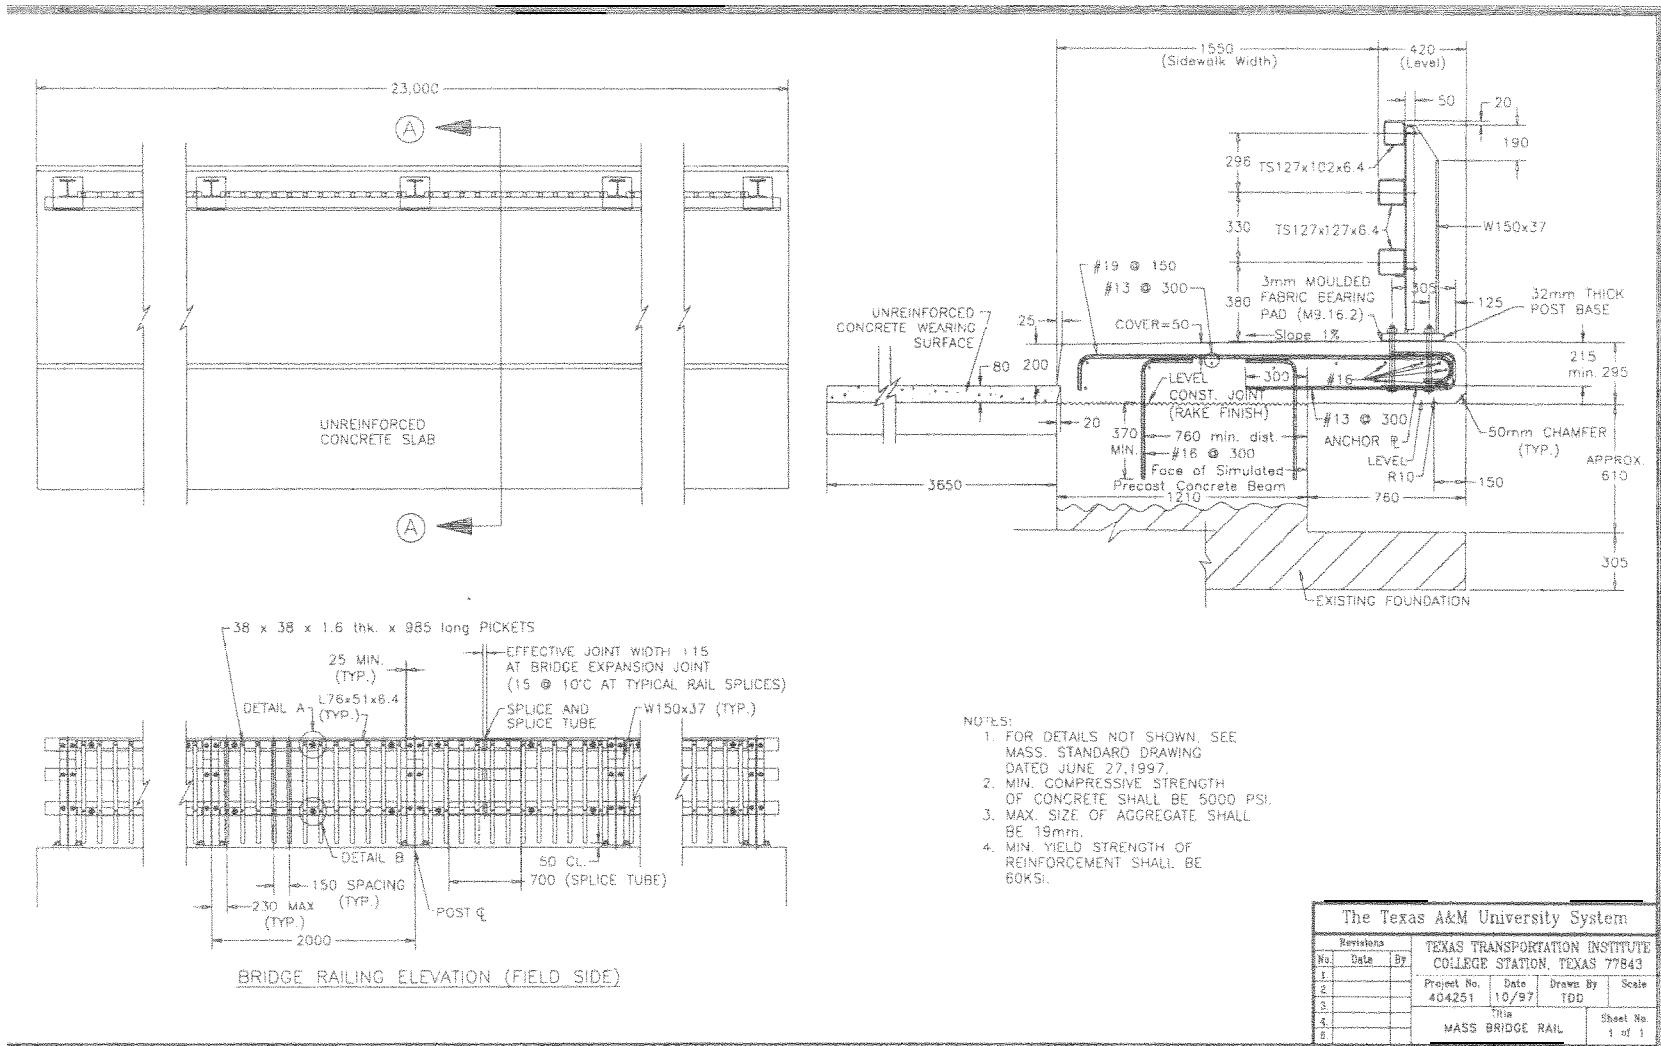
Details of the Massachusetts Type S3-TL4 Bridge Railing mounted on sidewalk with curb for tests 404251-1 through 3.
